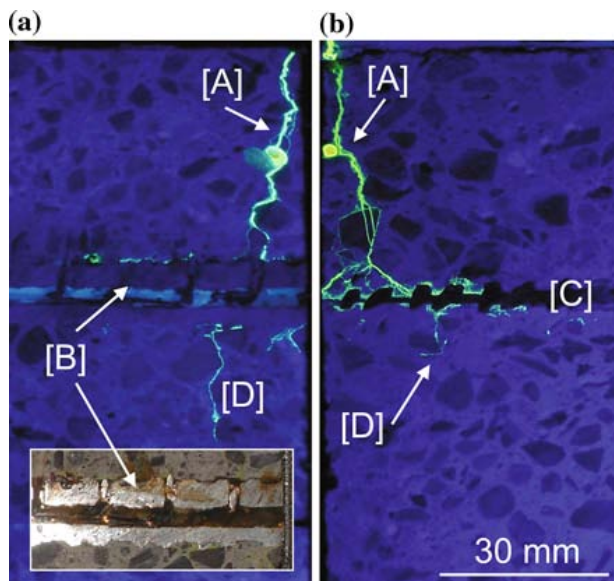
Parallel sections showing the a instrumented rebar and b standard rebar, with the following details indicated [A]—primary crack, [B]—instrumented rebar, [C]—standard rebar, and [D]—reflected cracking. The *top* of the image was the tension surface of the beam
